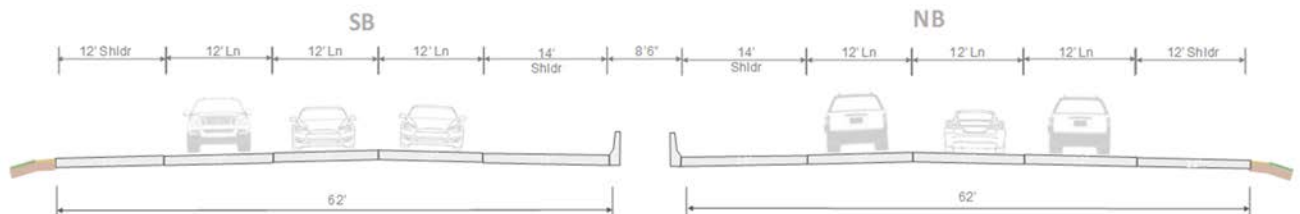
General Cross Section for Long-Term Build Alternative
